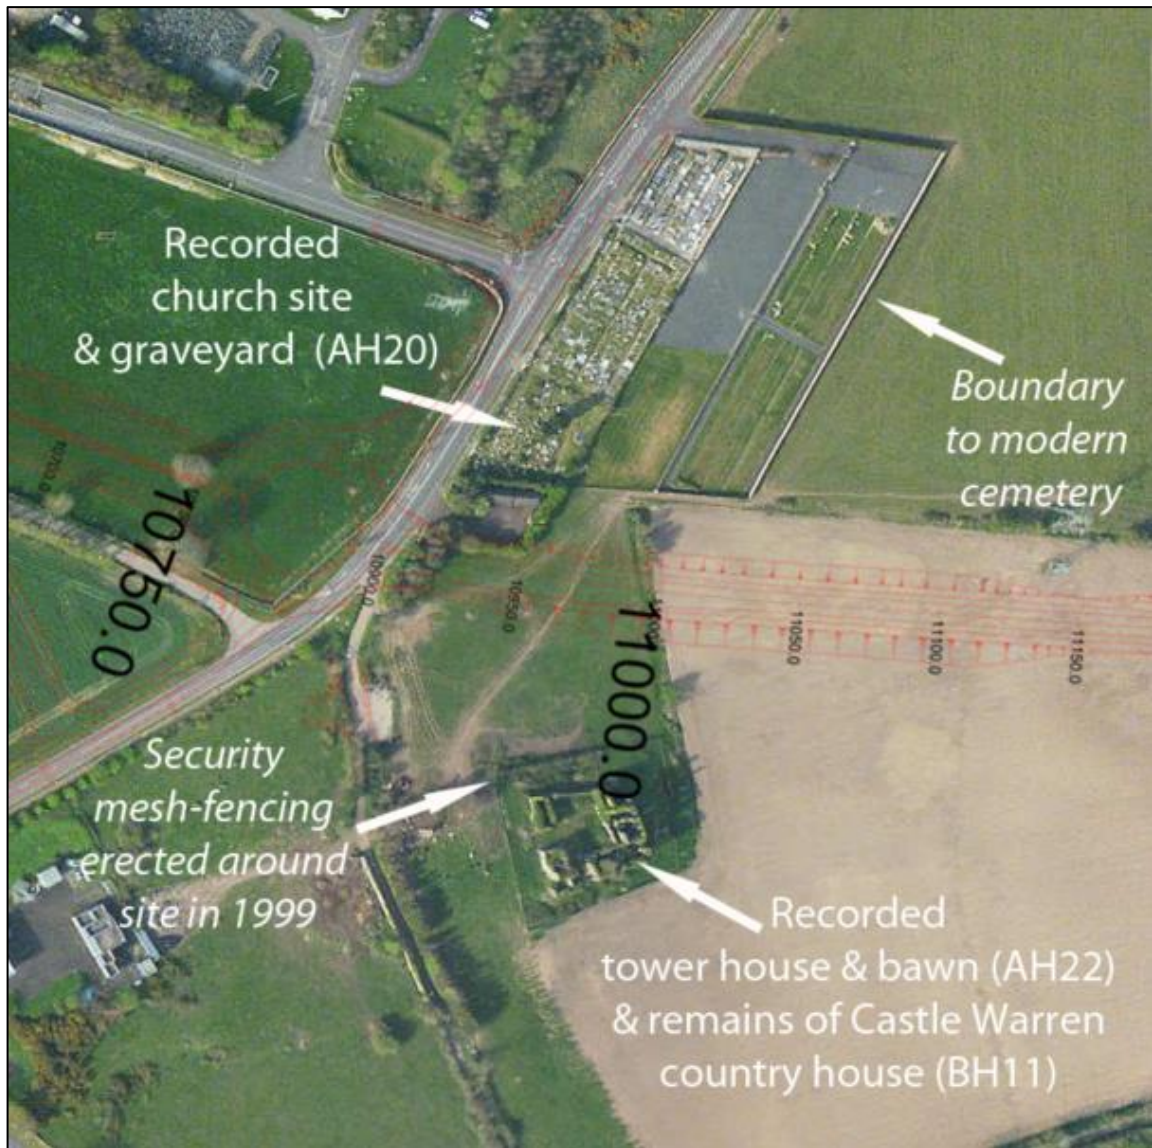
Aerial photograph (OSI Digital Globe 2013) showing showing Castle Warren (AH22 / BH11) & Barnahely church site & graveyard (AH20), with proposed M28 road project overlaid
